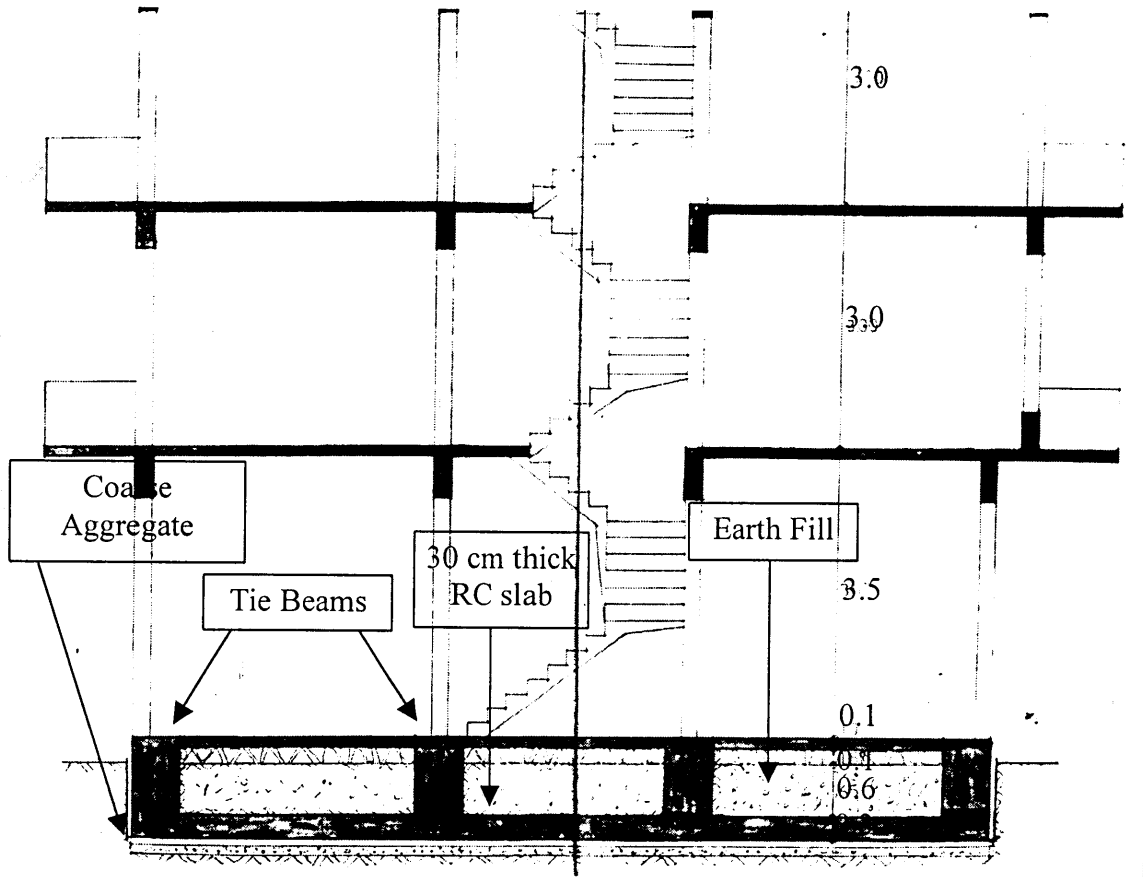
East-west cross section across the foundation, ground floor, and first floor of building D1
